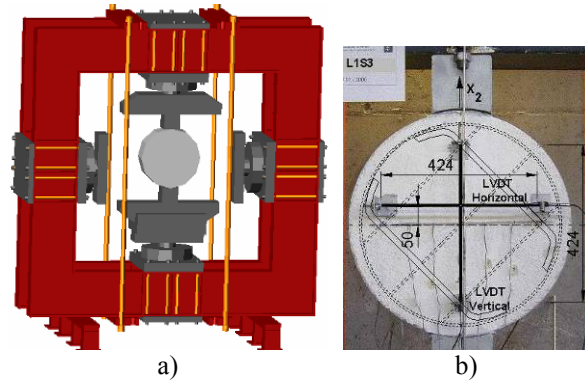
(a) Equipment and (b) test setup (dimensions in mm).
